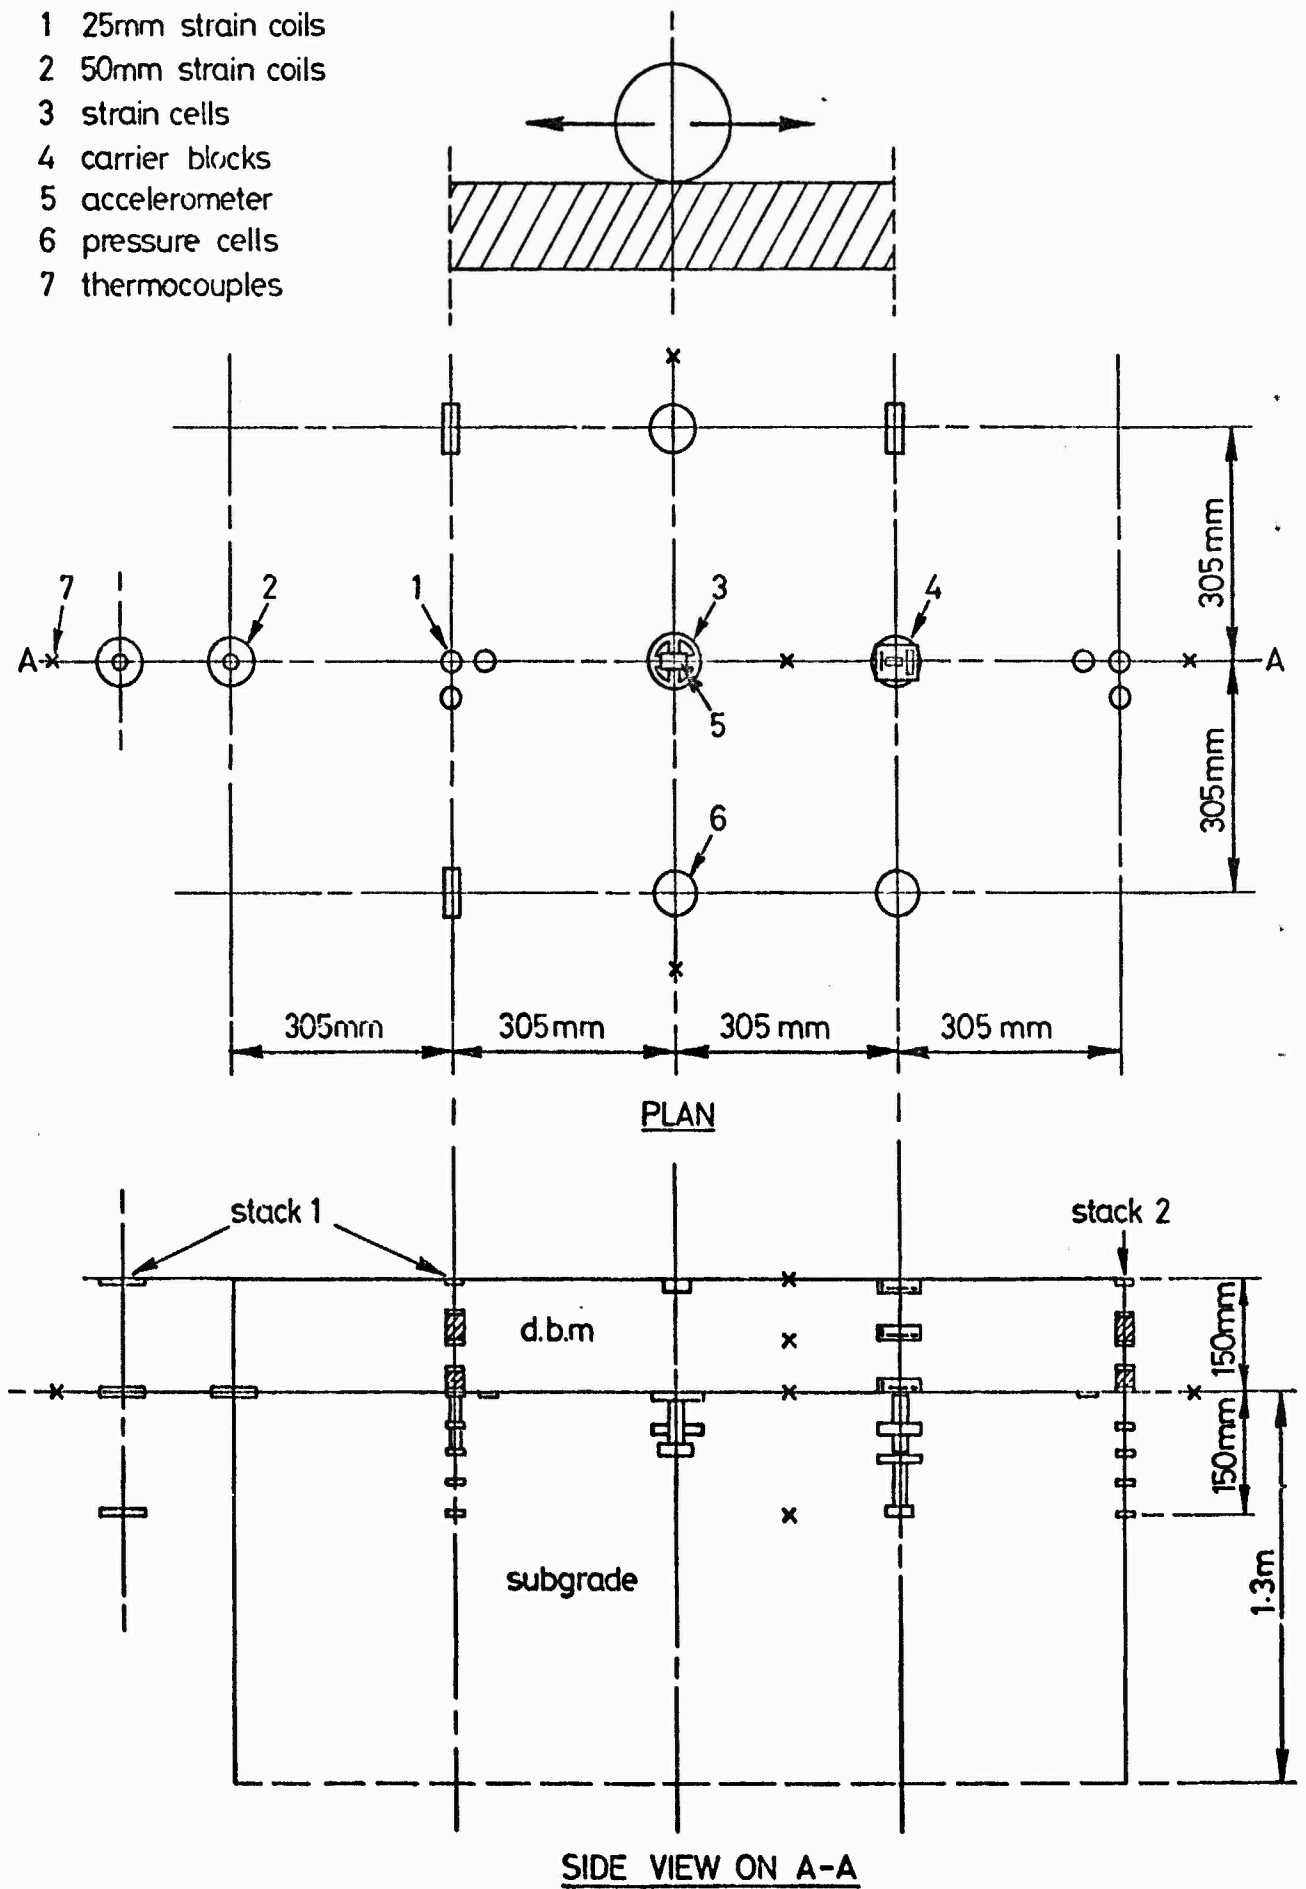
INSTRUMENT LAYOUT, PAVEMENT NO. 2
